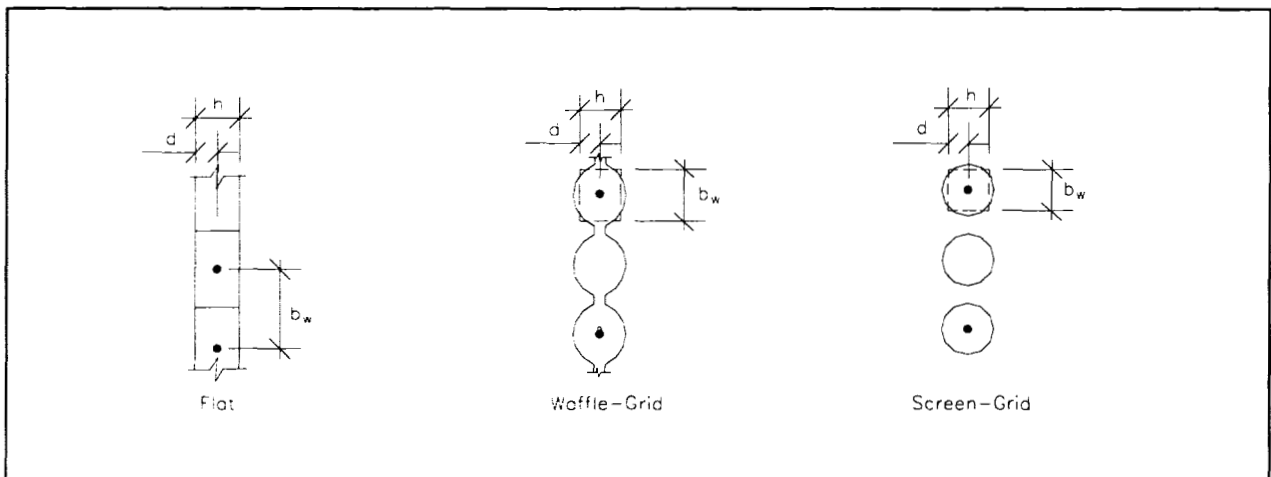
Design Variables Defined for Perpendicular Shear Calculations for Structural Reinforced Concrete Walls
